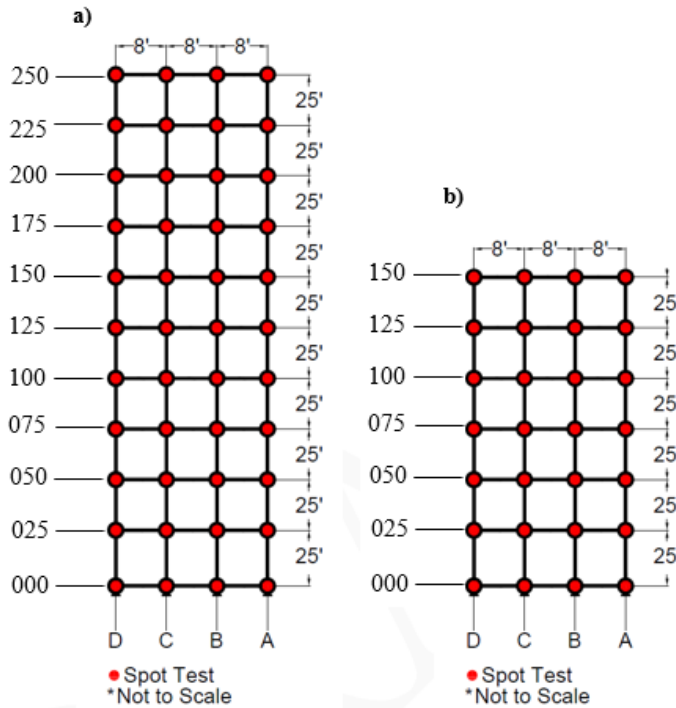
Schematic of the Typical Test Section and Location of Spot Tests for (a) Lime-Treated Subgrade and (b) Flexible Base Layer.
